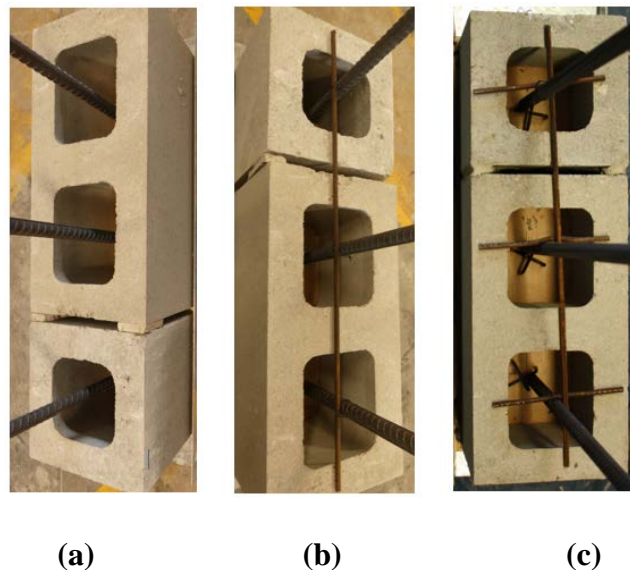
Different reinforcement provisions (a) Only vertical bars; (b) Vertical bars with one direction horizontal bar; (c) Vertical bars with two direction horizontal bars
